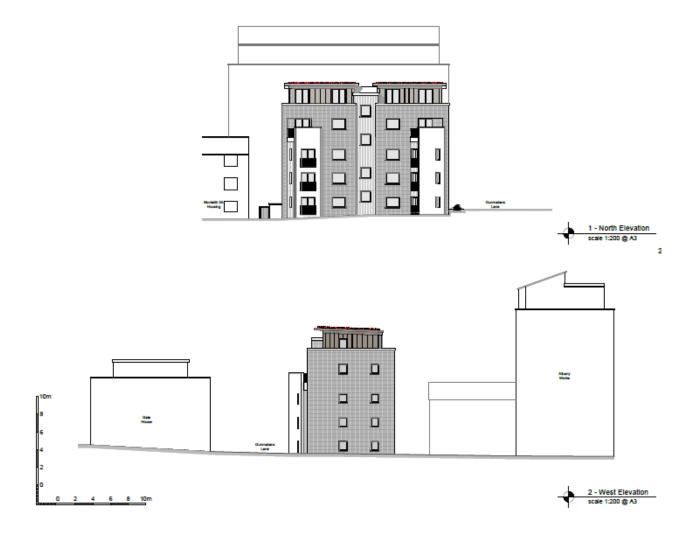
Contextual elevations showing the proposals against Albany Works to the south and Gate House to the north
